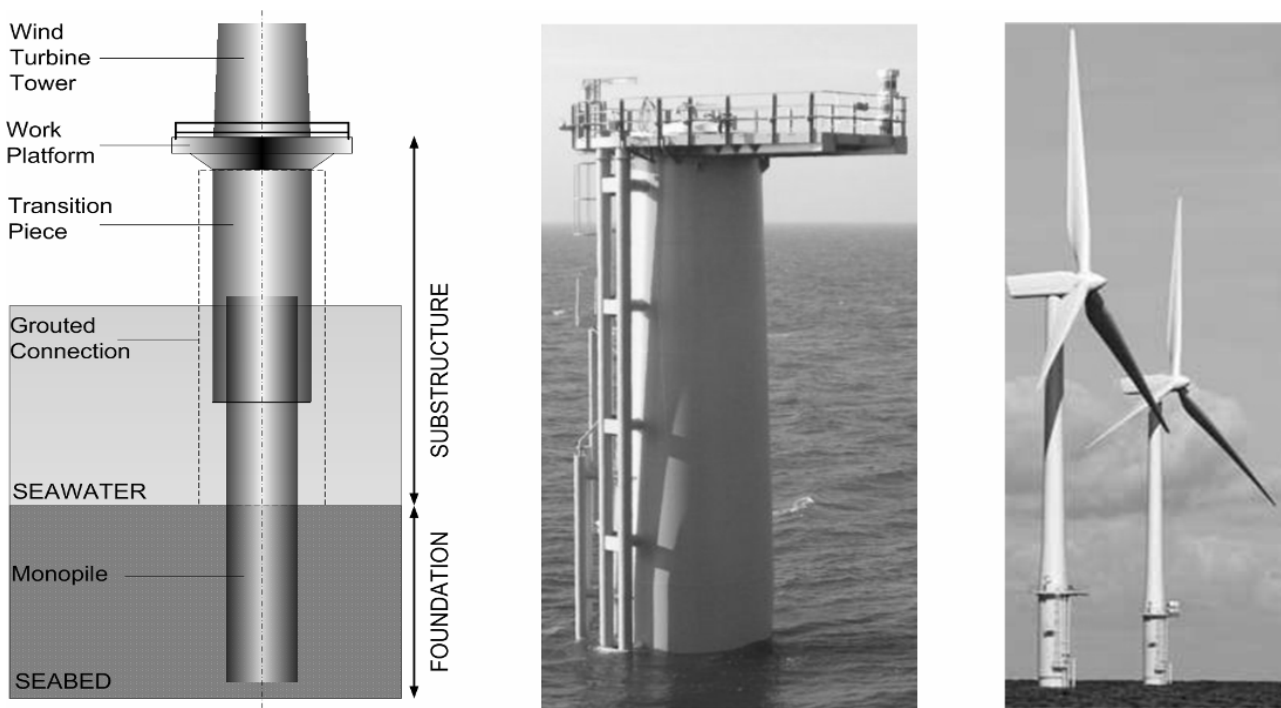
Grouted connection illustration and photos of installed arrangements.
